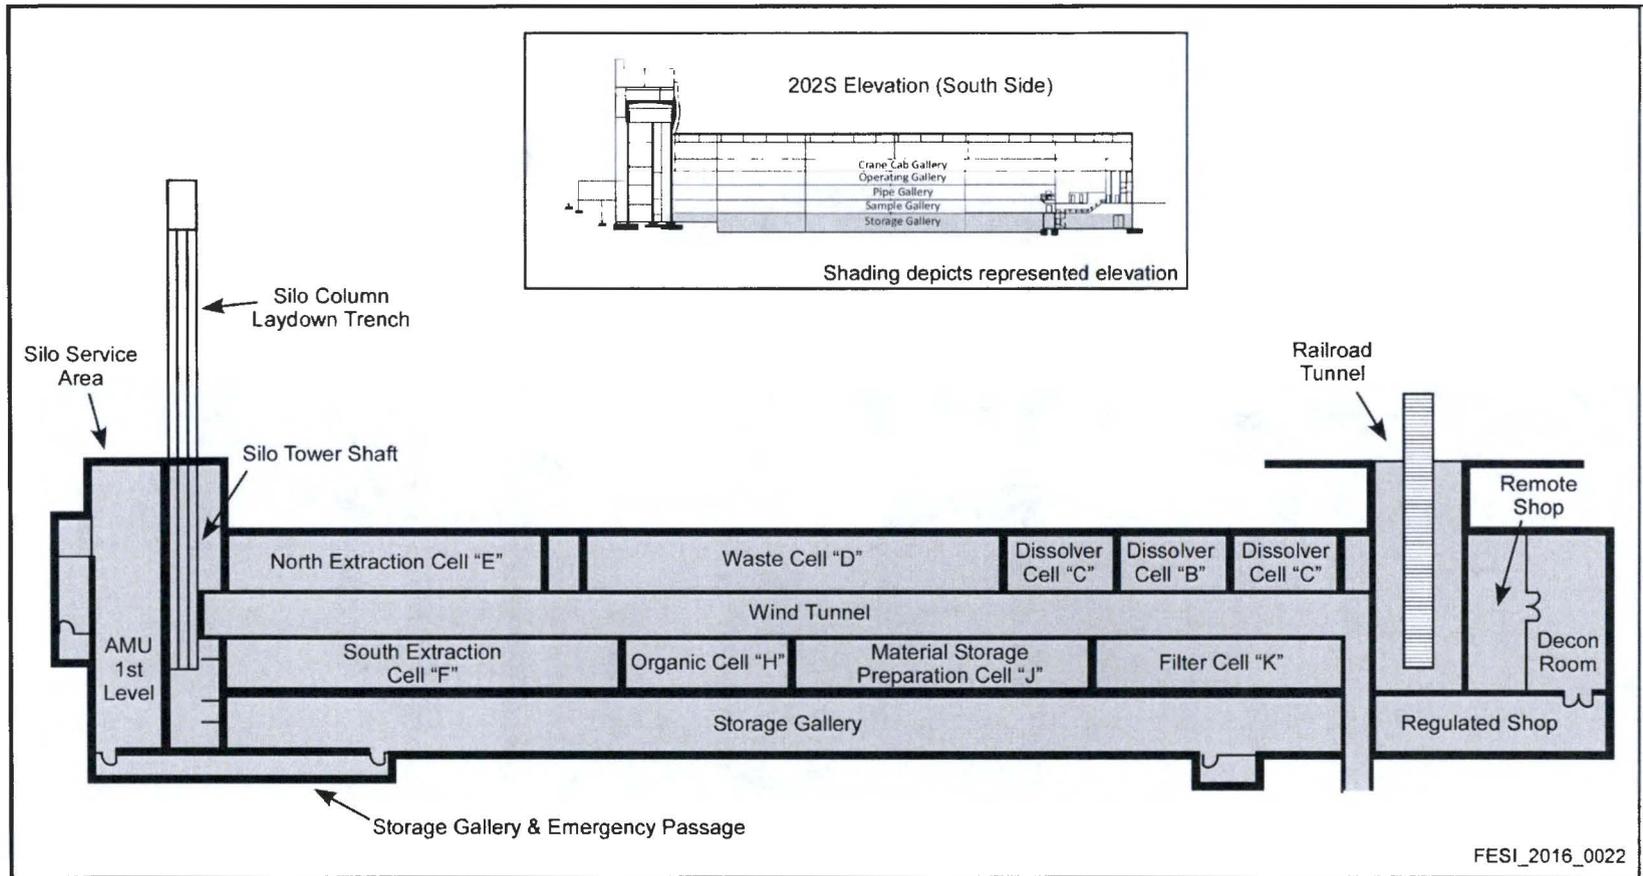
202S Building Plan View Storage Gallery Floor Level
